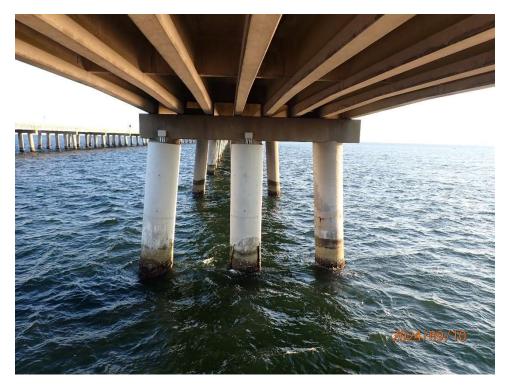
ANB202 – Substructure with fiberglass jackets . Jackets typically in good condition with isolated areas of jacket failure at waterline.
